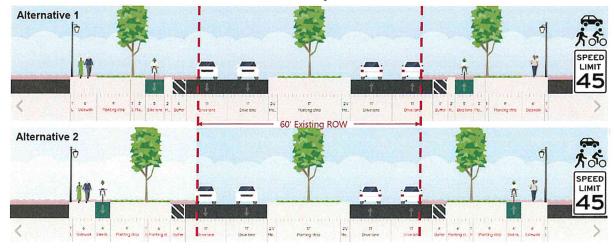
Rural Section: Standard 4-Lane Roadway
